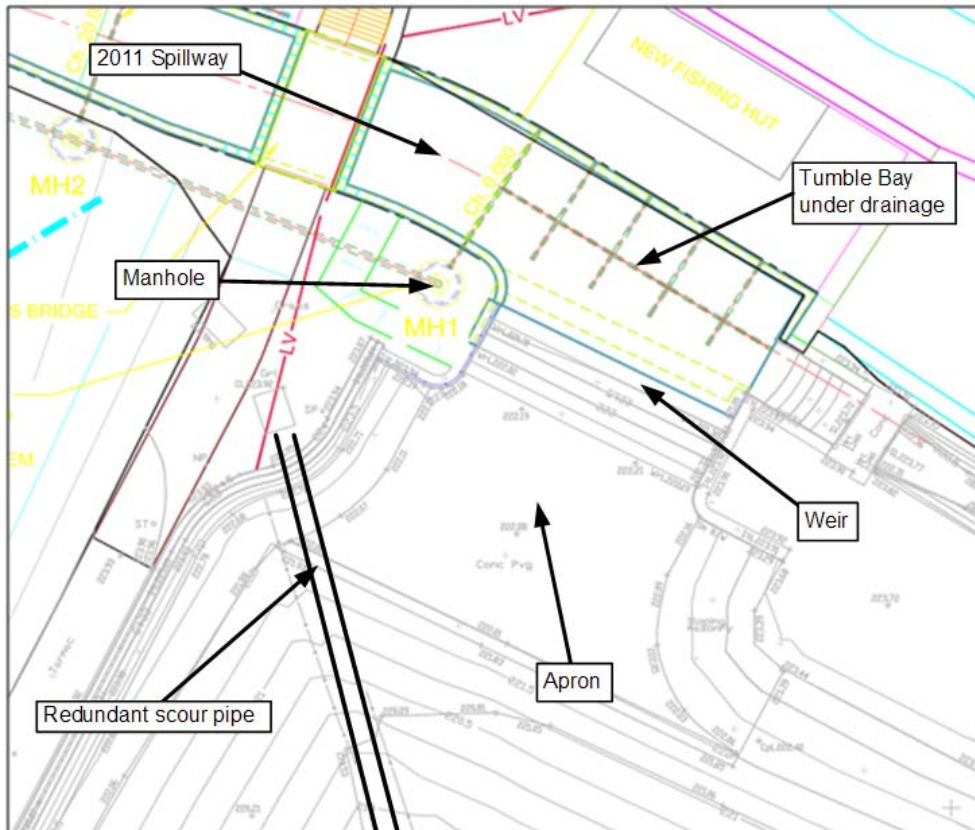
Bollinhurst IR Spillway and Tumble Bay Arrangement (extract UU drawing 7376_90021233_01_32_2107_AS BUILT)
